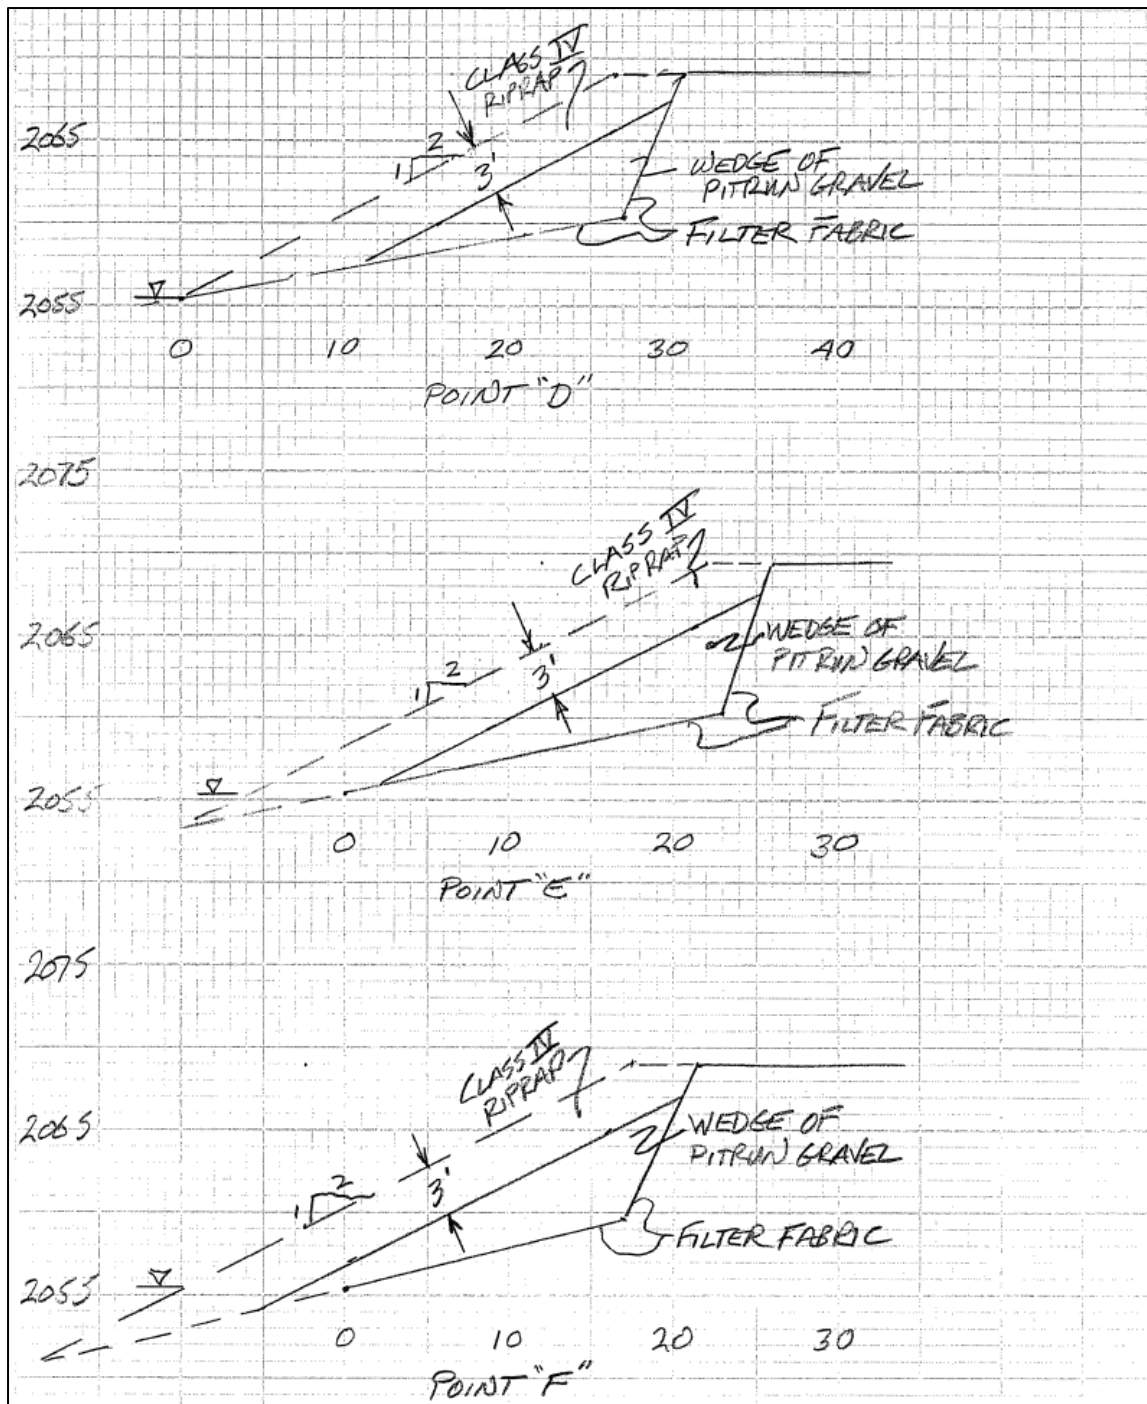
Priest River project plan and design details, bank profile from east to west.
